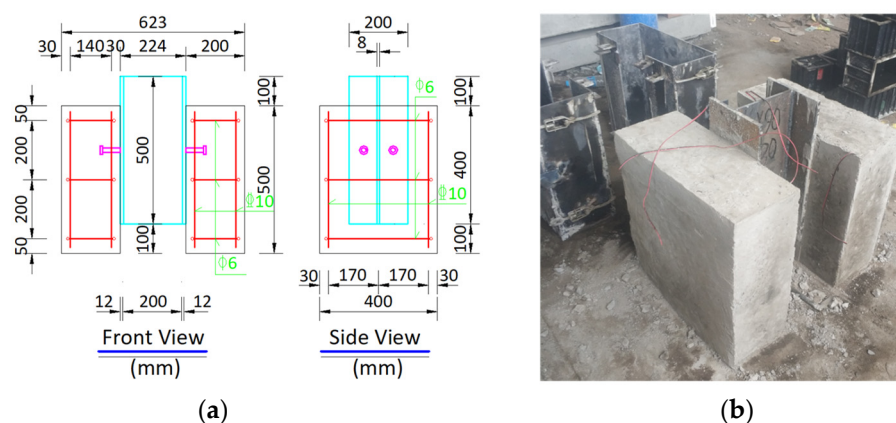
Push-out specimens: (a) design dimensions; (b) actual photograph.
